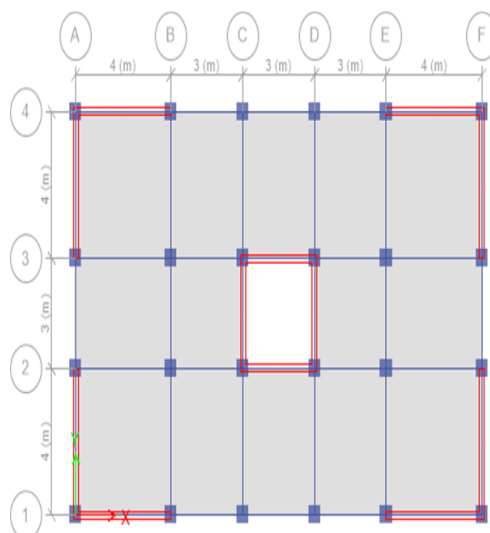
Plan view of the Structure with Shear Wall at Center and corners
